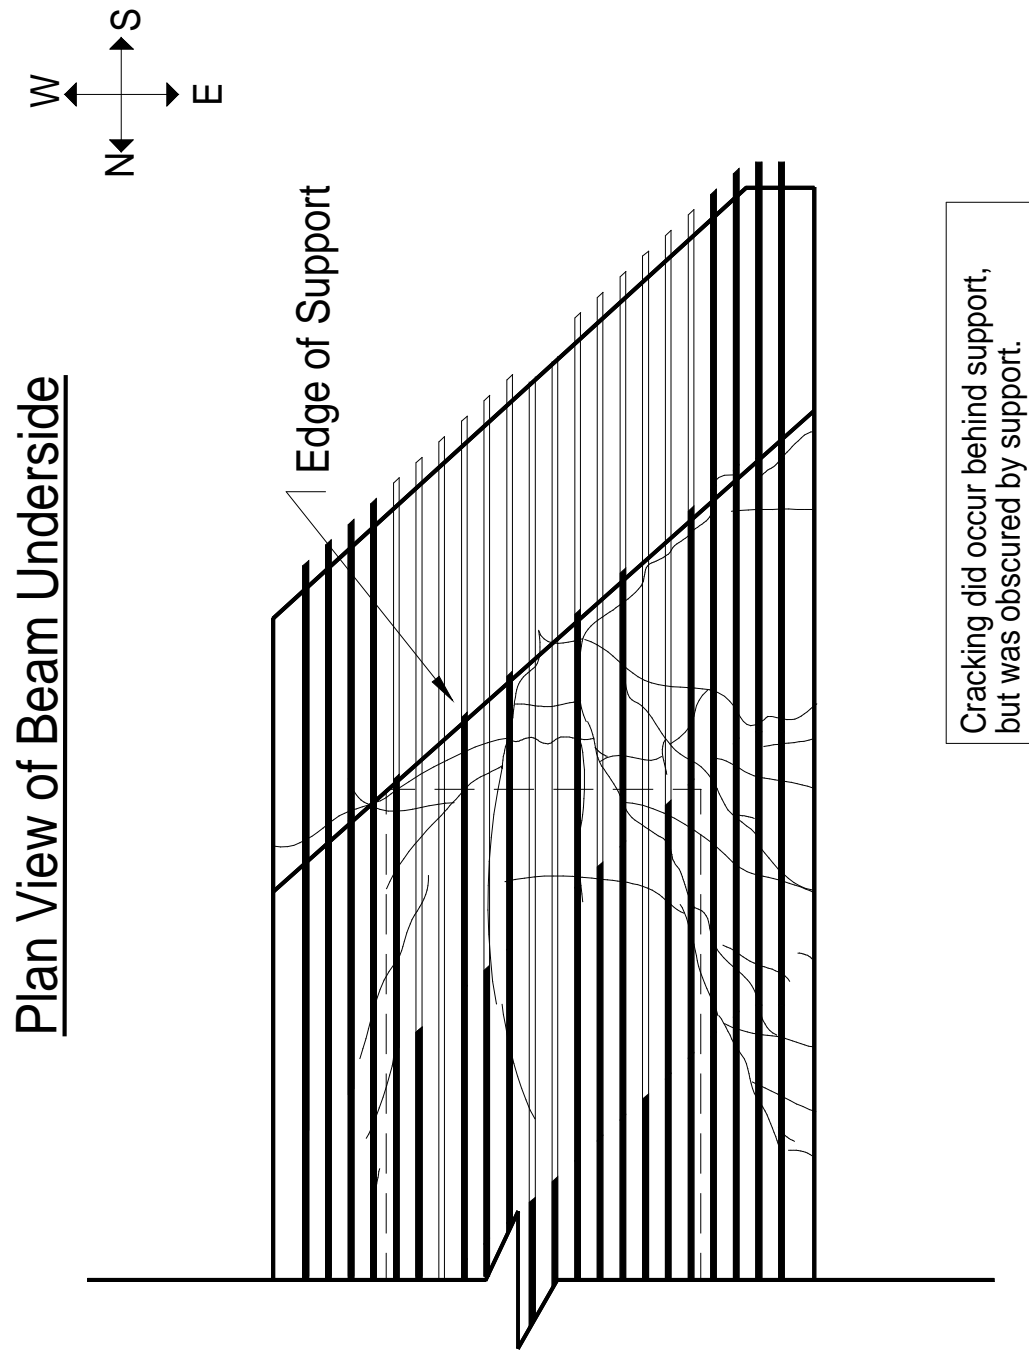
Post-test Cracking on Bottom Flange of Box Beam 3 - Test 1 w/ superimposed pretensioned steel
